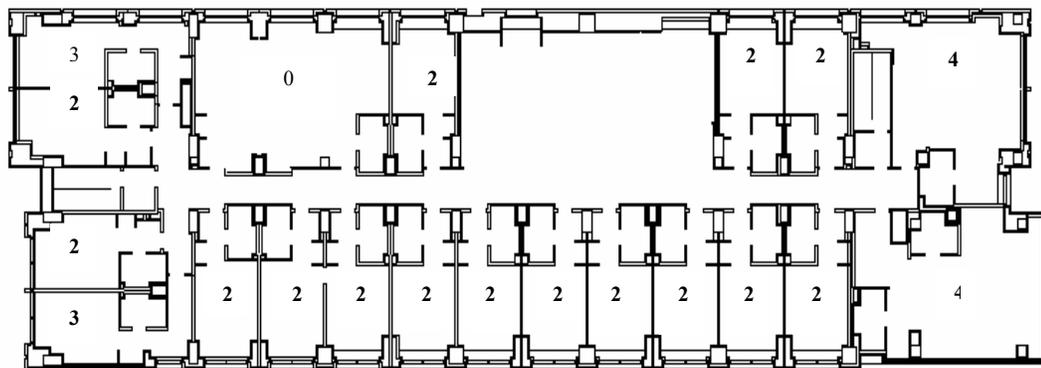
Occupant Load on Floor 4 (adjusted to Floor 1)
